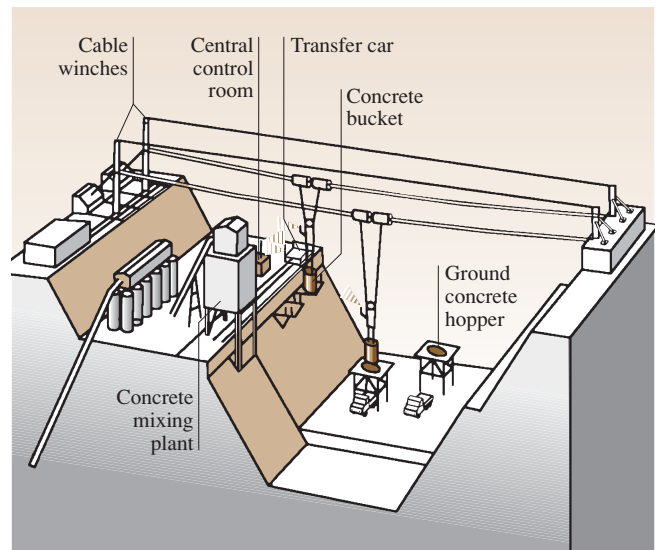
Diagram of automatic system for transporting concrete mix on dam construction site
